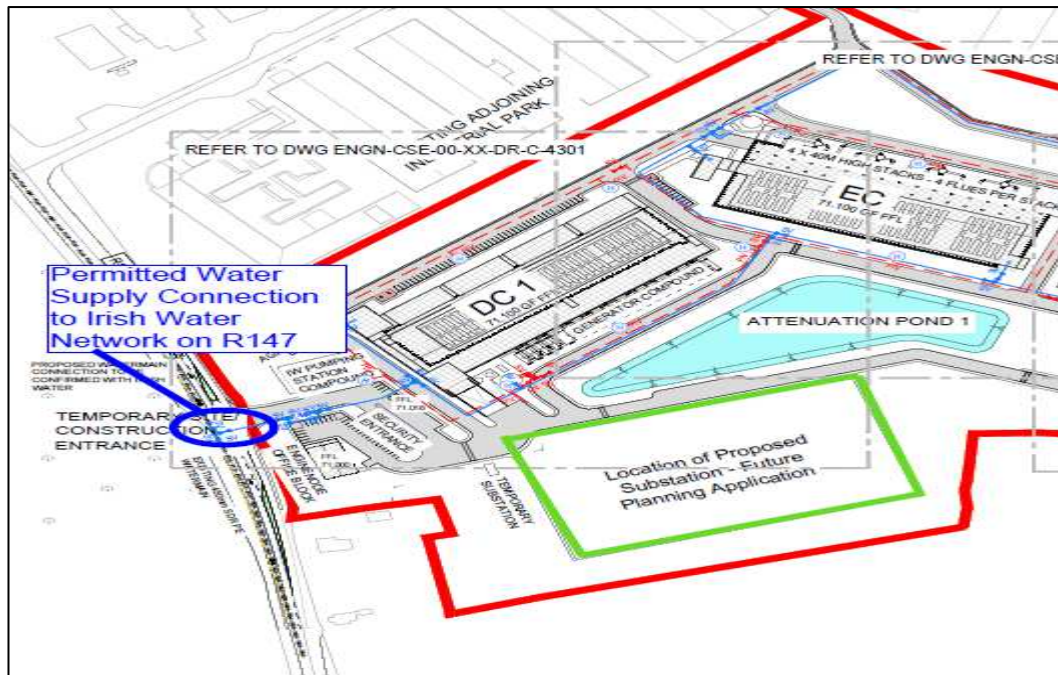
Extract from Drawing No. ENGN-CSE-00-XX-DR-C-4300 indicating proposed connection to Irish Water Network
